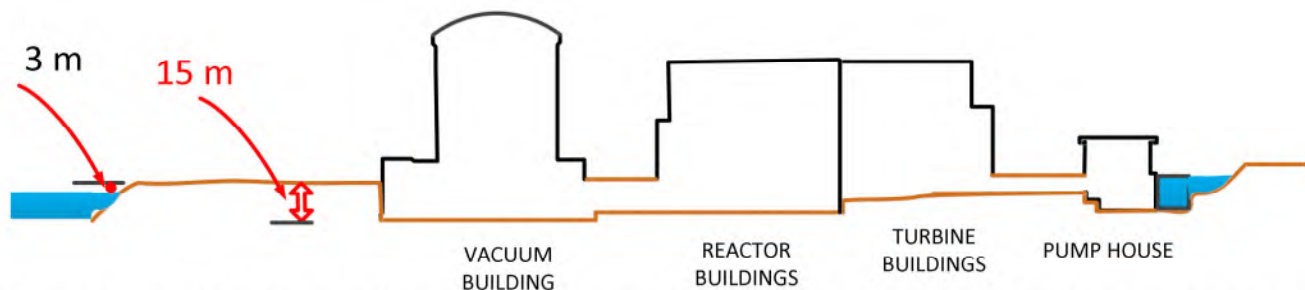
Building basement layout below Lake water level. The emergency power supply generators are at grade level with cable tunnel 6m under.
